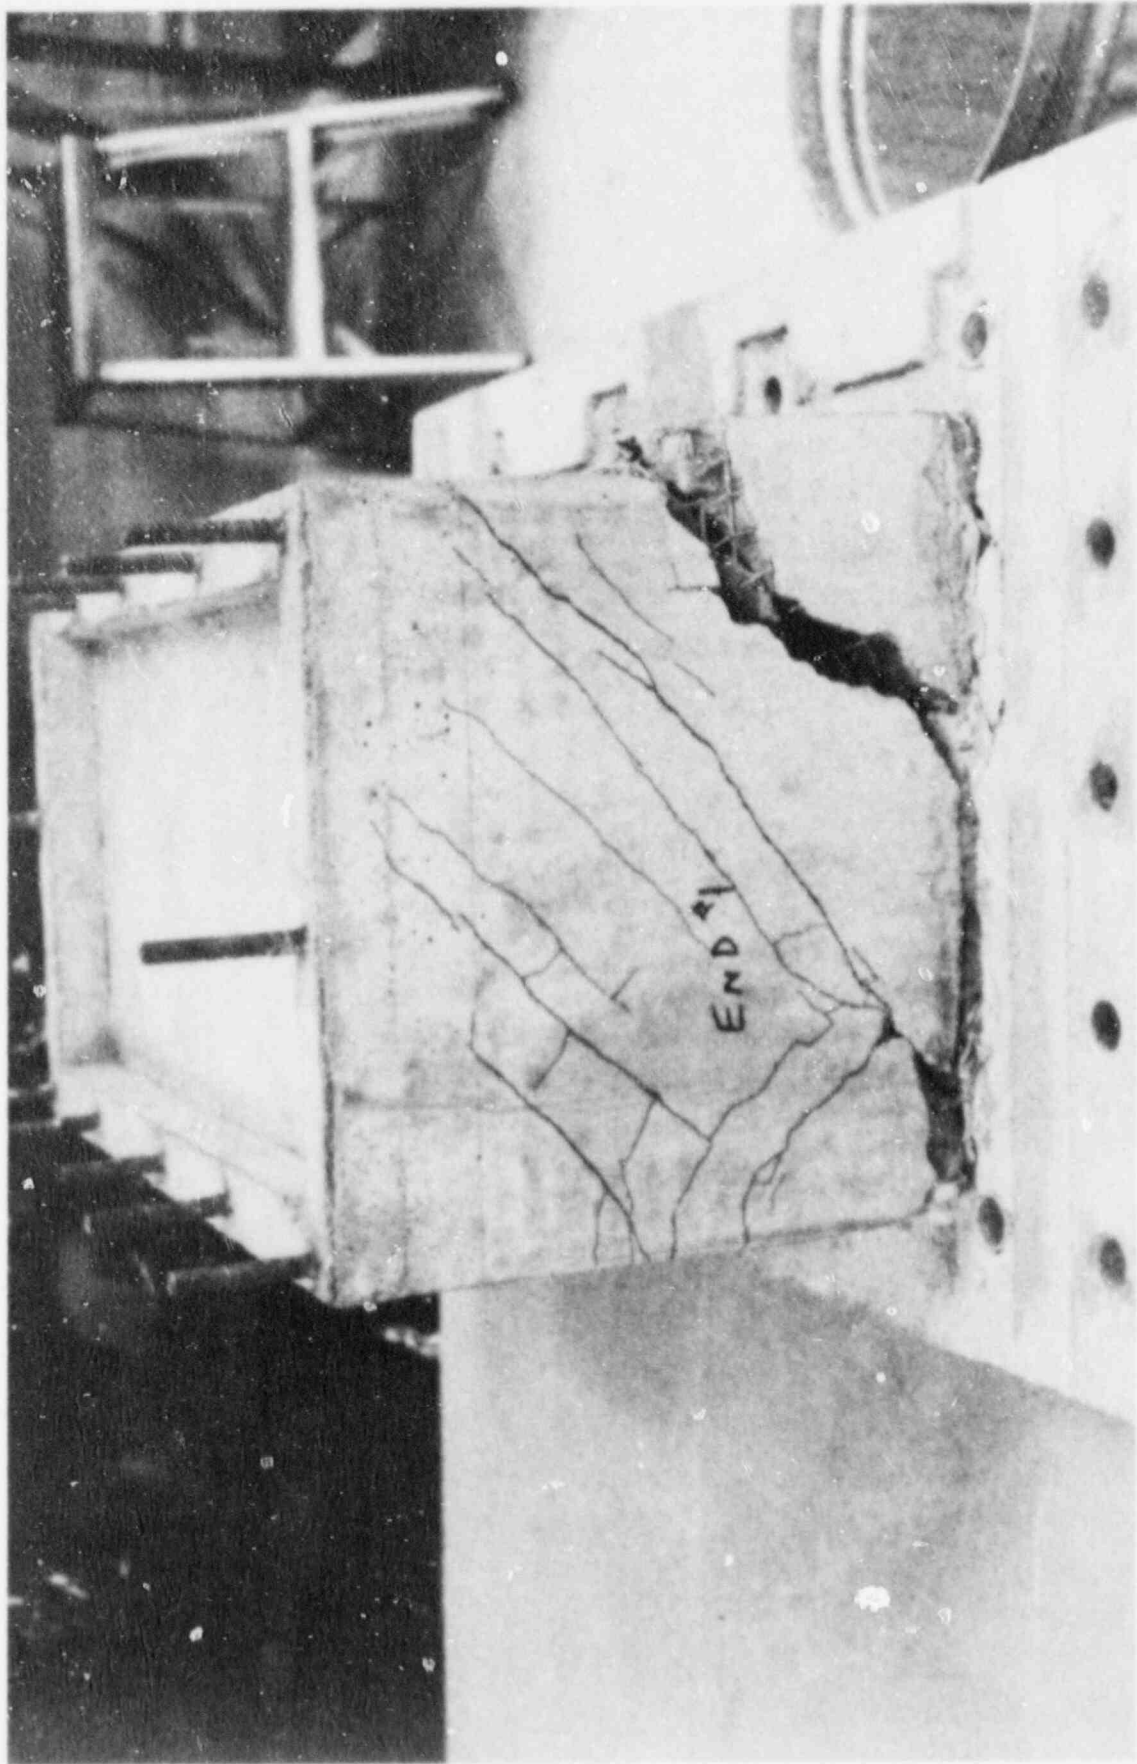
Single-story, 1/30-scale structure failed by monotonic, transverse static load.
